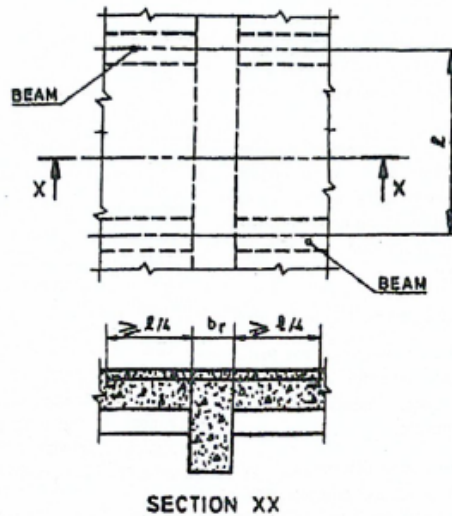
TRANSVERSE REINFORCEMENT IN FLANGE OF T-BEAM WHEN MAIN REINFORCEMENT OF SLAB IS PARALLEL TO THE BEAM
